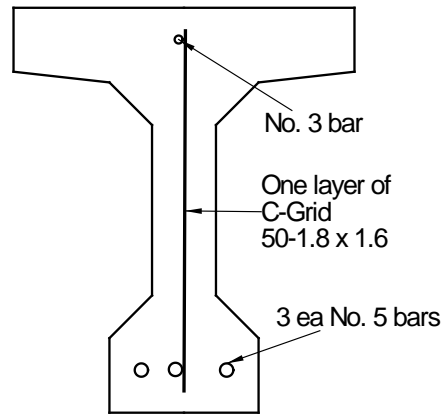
Cross-Section of Specimen 2 with Minimum C-Grid Reinforcement
